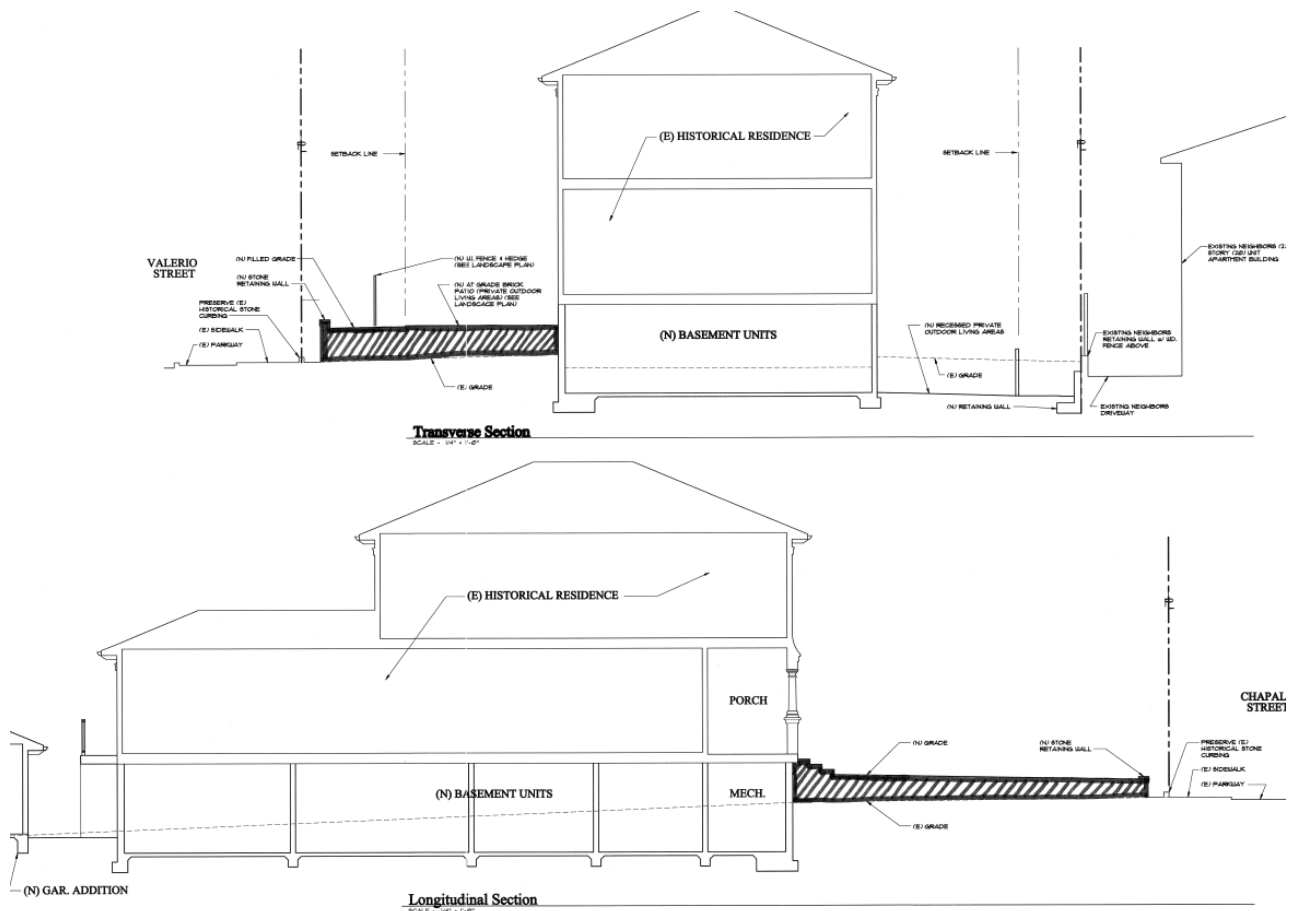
, Transverse and Longitudinal Sections of House with Proposed Sections
